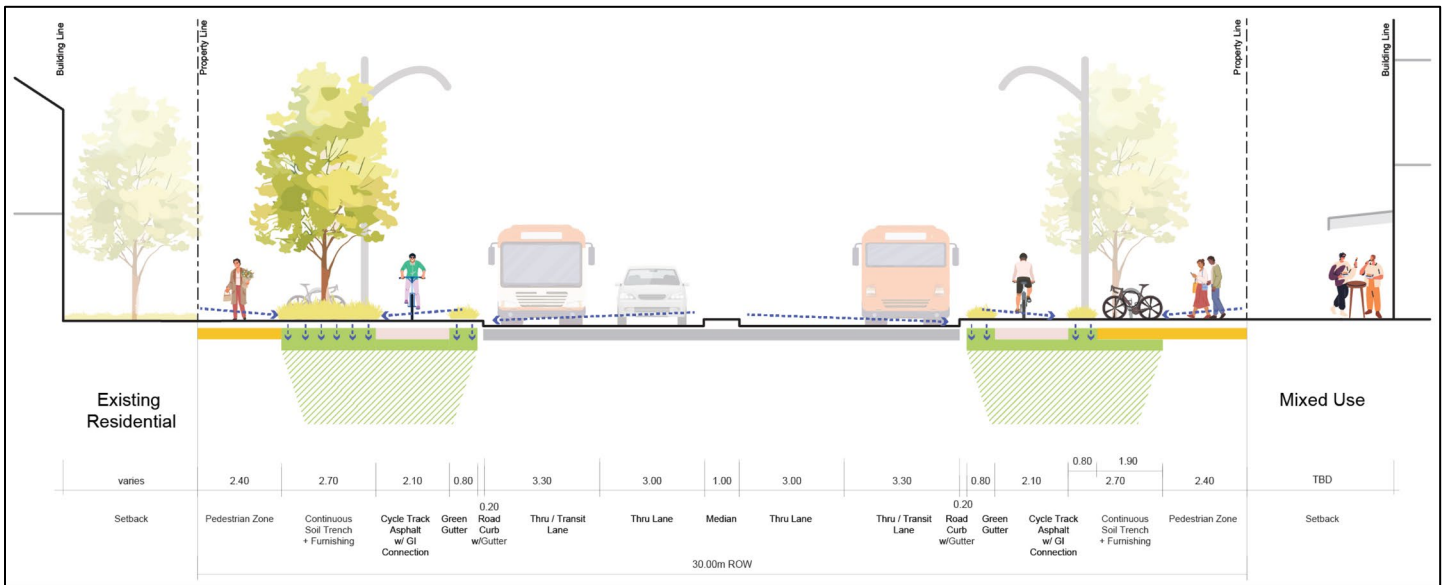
Existing Dufferin Street (Wilson Avenue to Beffort Road) Cross-Section - Option 3
